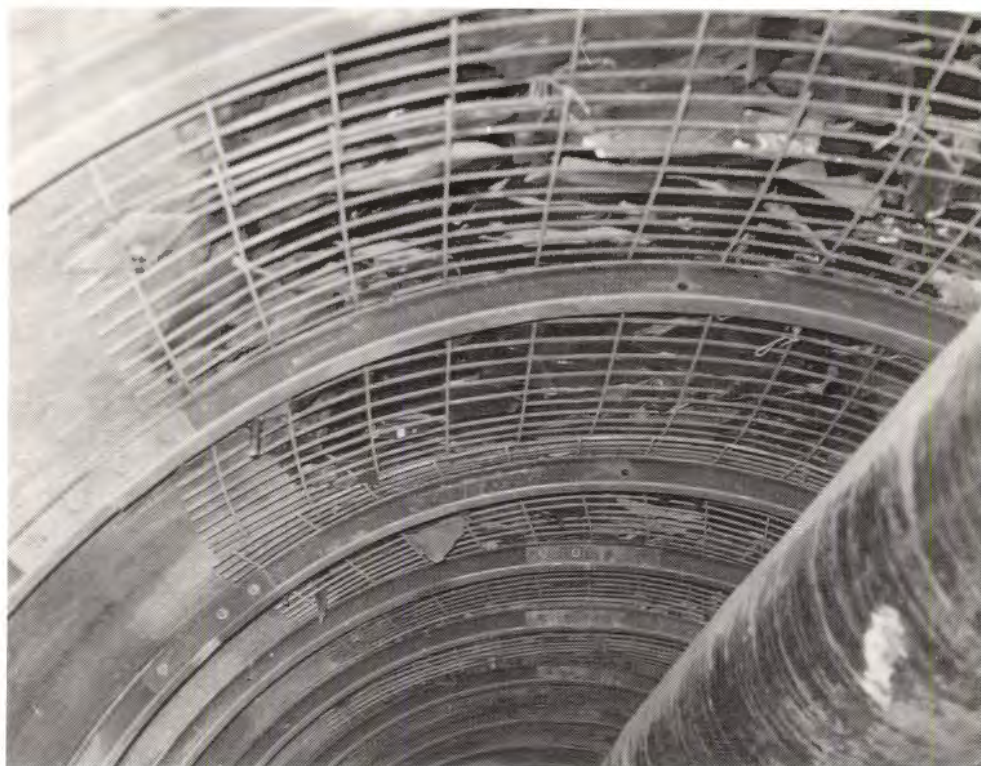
Steel sets and wire mesh used to support blocky mudstone in crown, Tees station 4050 to 4060
